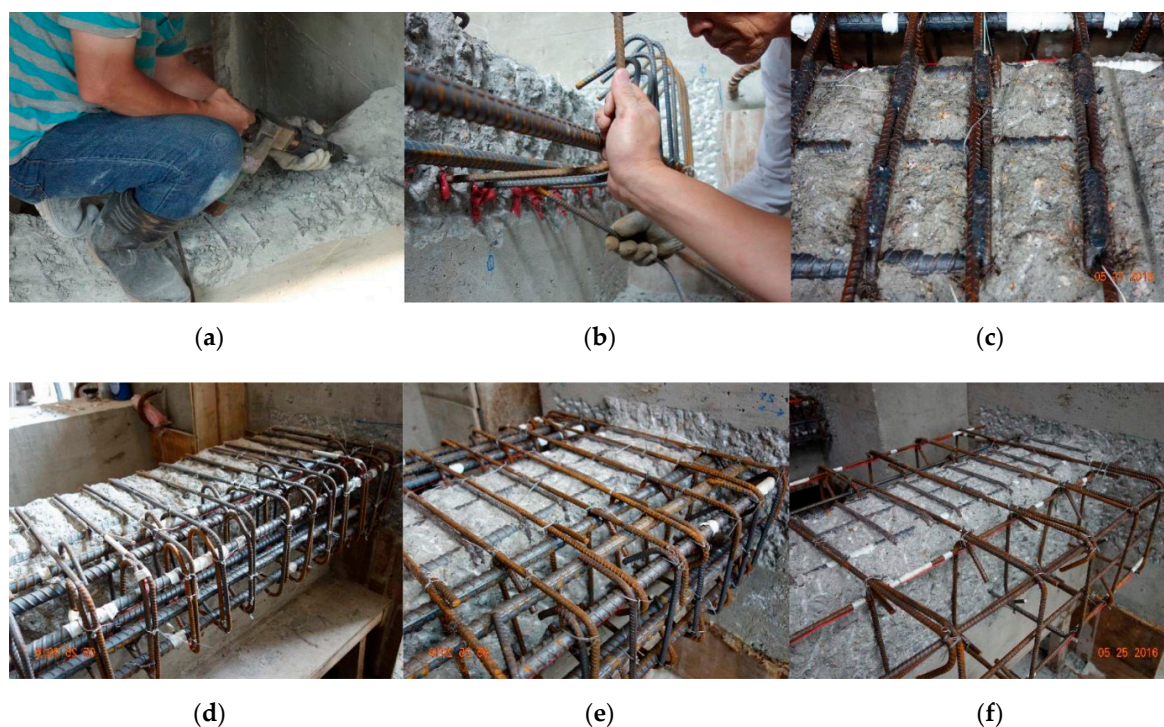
Repair with RC Jacketing: (a) Removing the cover concrete and roughening the surface; (b) Post-installation of transverse reinforcement; (c) Welding of transverse reinforcement; Reinforcement cage for an (d) L-shaped column; (e) T-shaped column; (f) T-shaped column with wall-type reinforcement [7-Elsevier Copyrights].
